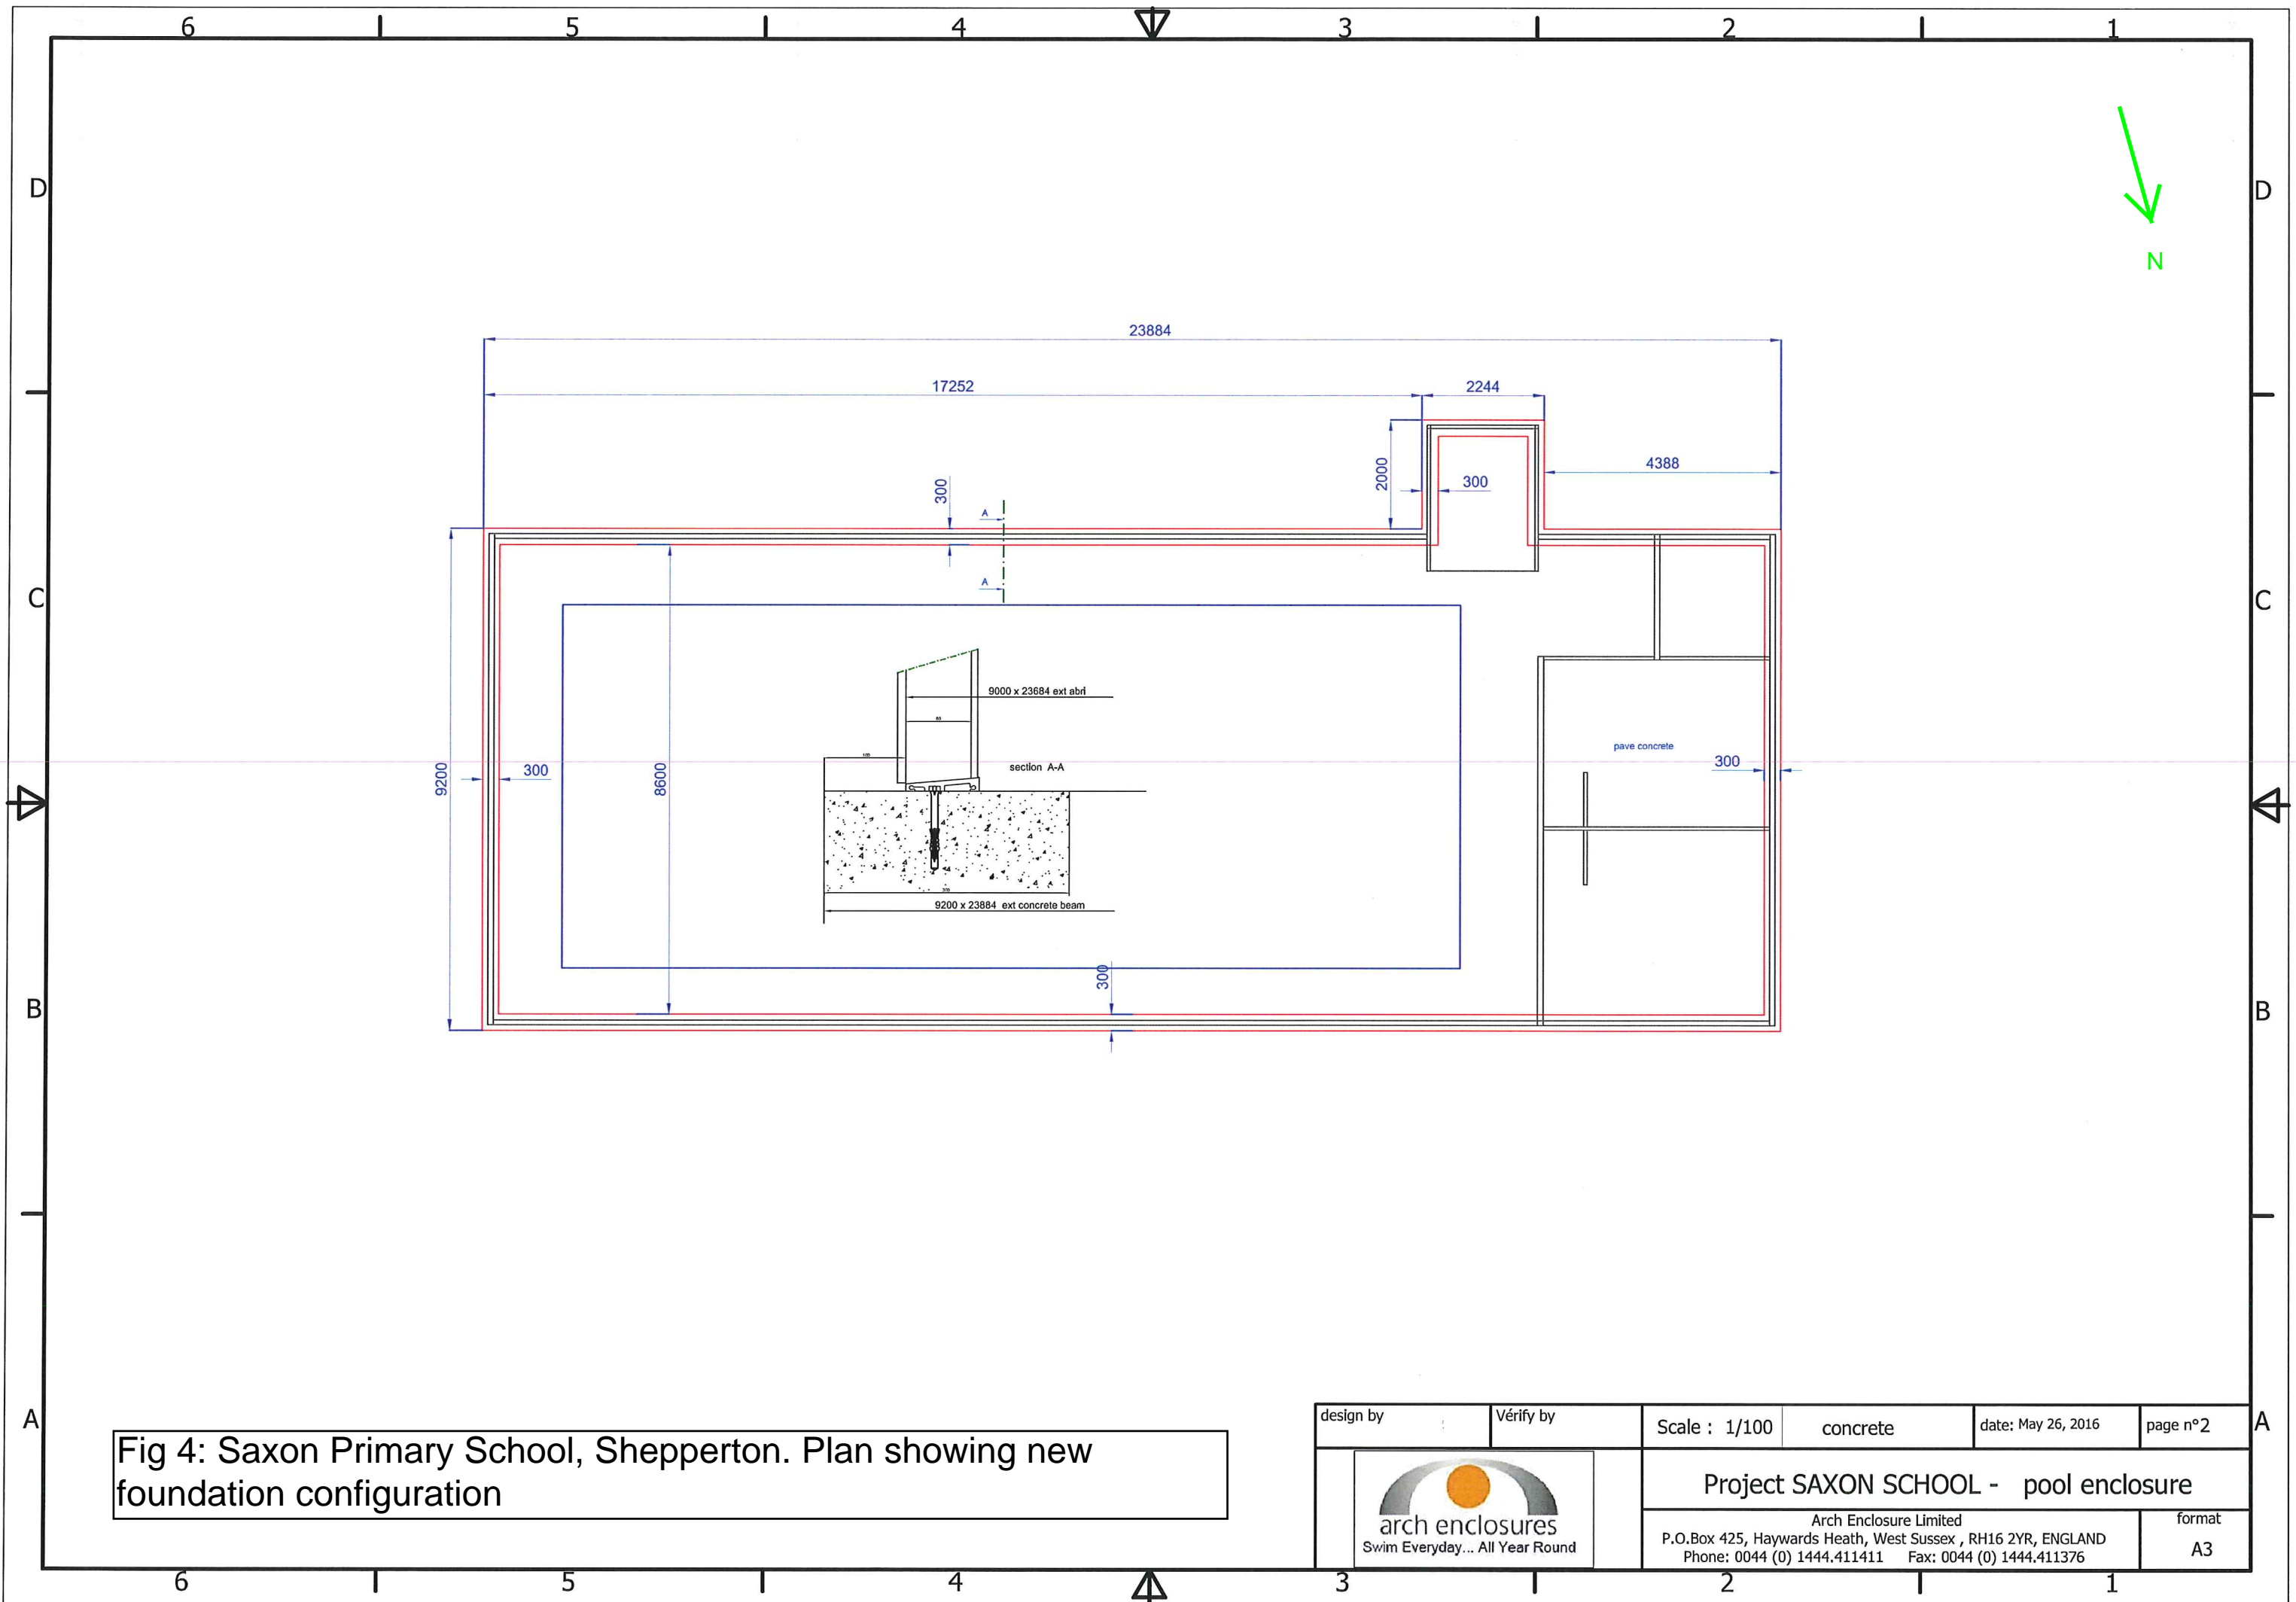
Saxon Primary School, Shepperton. Plan showing new foundation configuration
